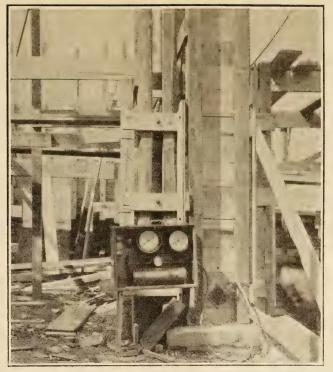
SHOWING POURING OF COLUMN, FIELD TEST.
